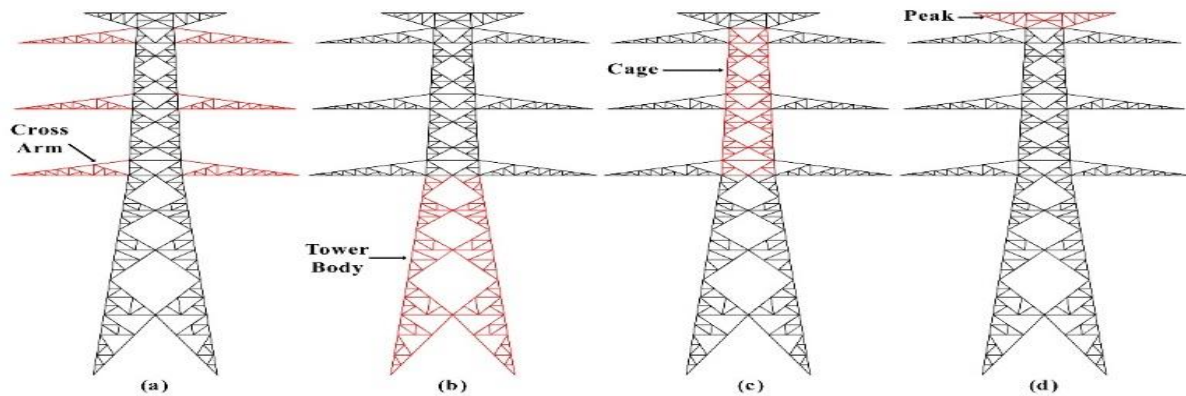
Transmission tower parts a- Cross arm b - tower body c- cage d-peak
